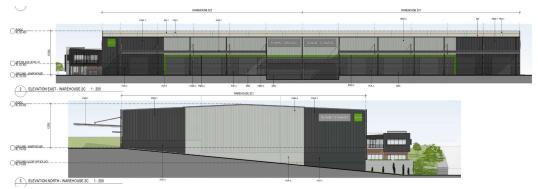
Warehouse 2C Elevations (Source: SBA Architects)
